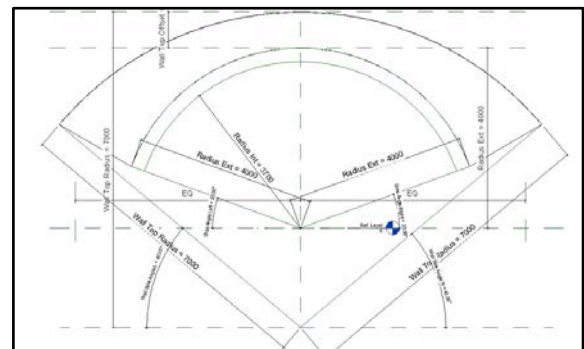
Family wing wall. Parameters: outer arc radius, parapet radius, parapet height, parapet start and end angles
